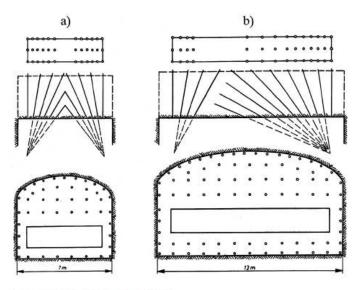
9. V cut (a) and Fan cut (b).
